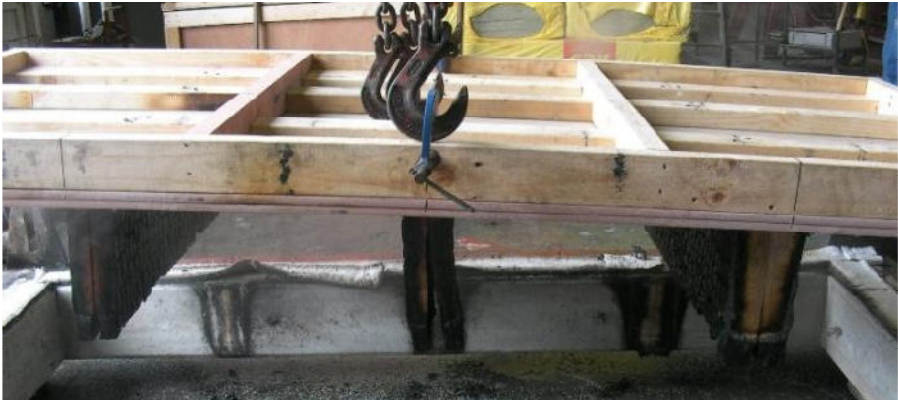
End view of these three tested LVL specimens after a 45 minute of fire exposure
